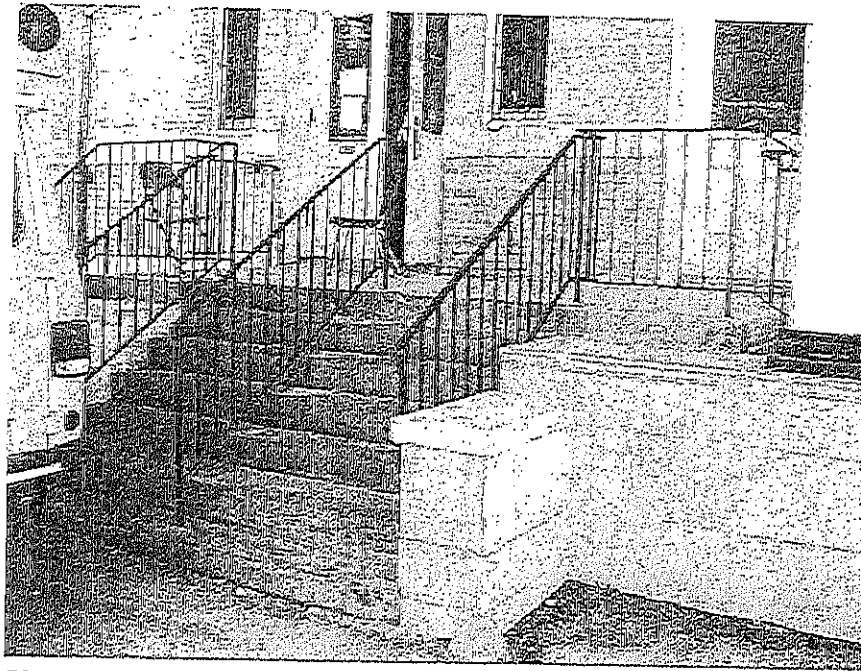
Open mortar joints in marble walls and open joints between bluestone steps and marble cheekwalls provide access for water infiltration. The concrete slab poured to raise the level of the porch floor for handicapped accessibility is incompatible with the historic stone materials of the stair structure.
